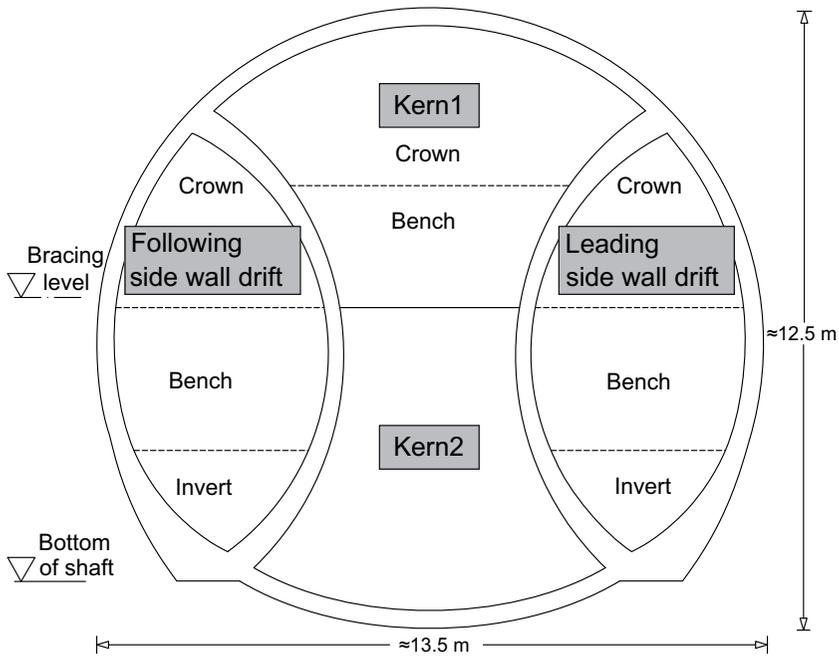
Cross section of the tunnel, including the two side wall drifts
